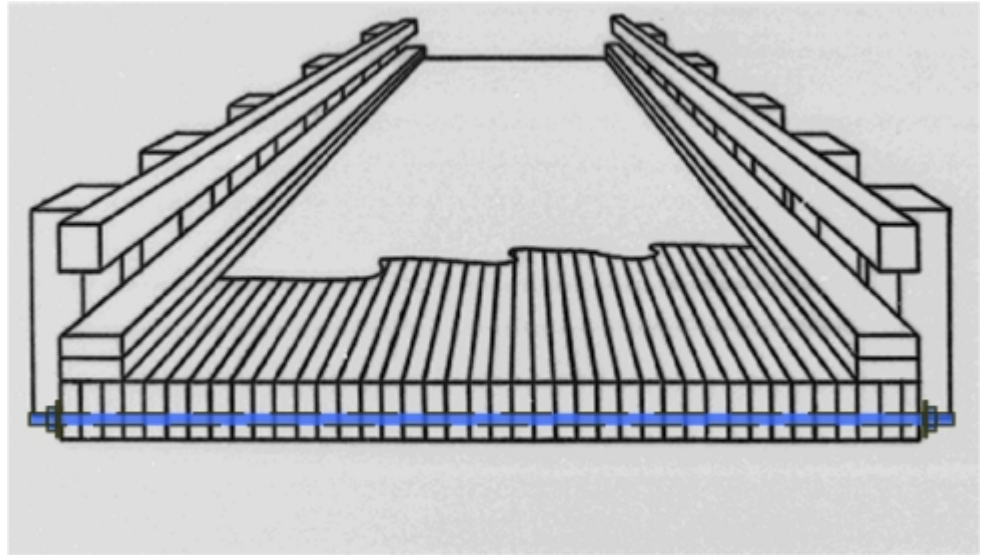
Typical Section of a Stress-Laminated Timber Slab Bridge
